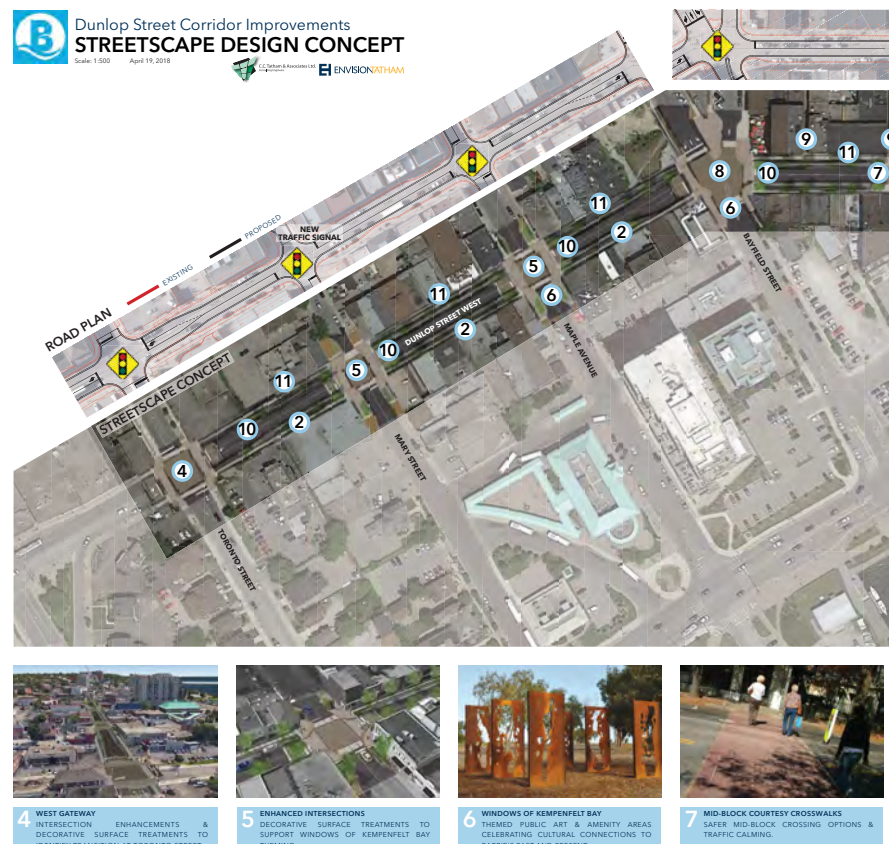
Dunlop Street Corridor Improvements Streetscape Design Concept showing surrounding proposed future improvements near to the site along Dunlop Street West
